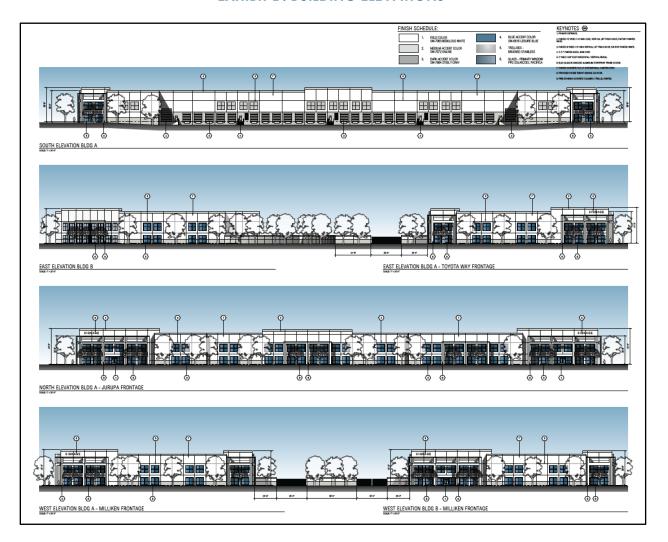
EXHIBIT D: BUILDING ELEVATIONS (CONTINUED)
